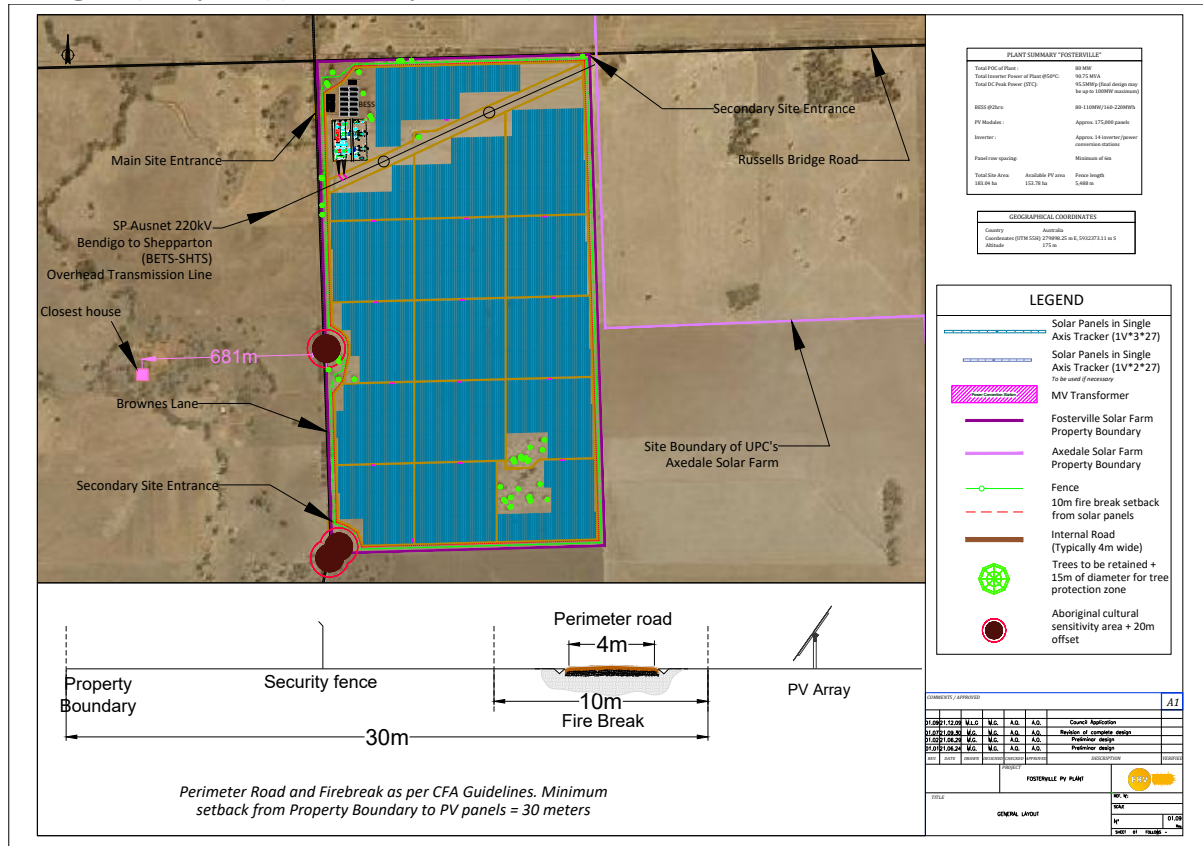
Extract of General Layout Plan of the proposed Fosterville solar farm
